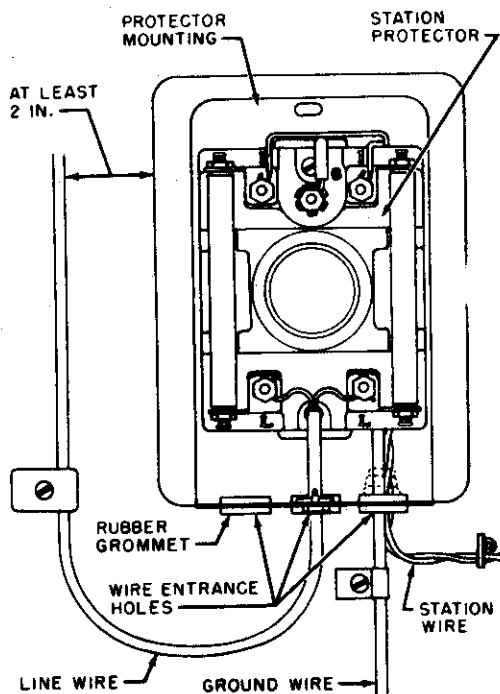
Typical Conductor Arrangement, Station Protector in Protector Mounting
